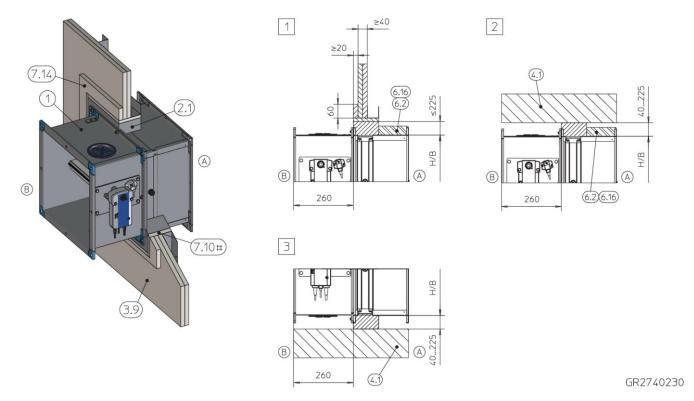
Mortar-based installation in a shaft wall without metal support structure
